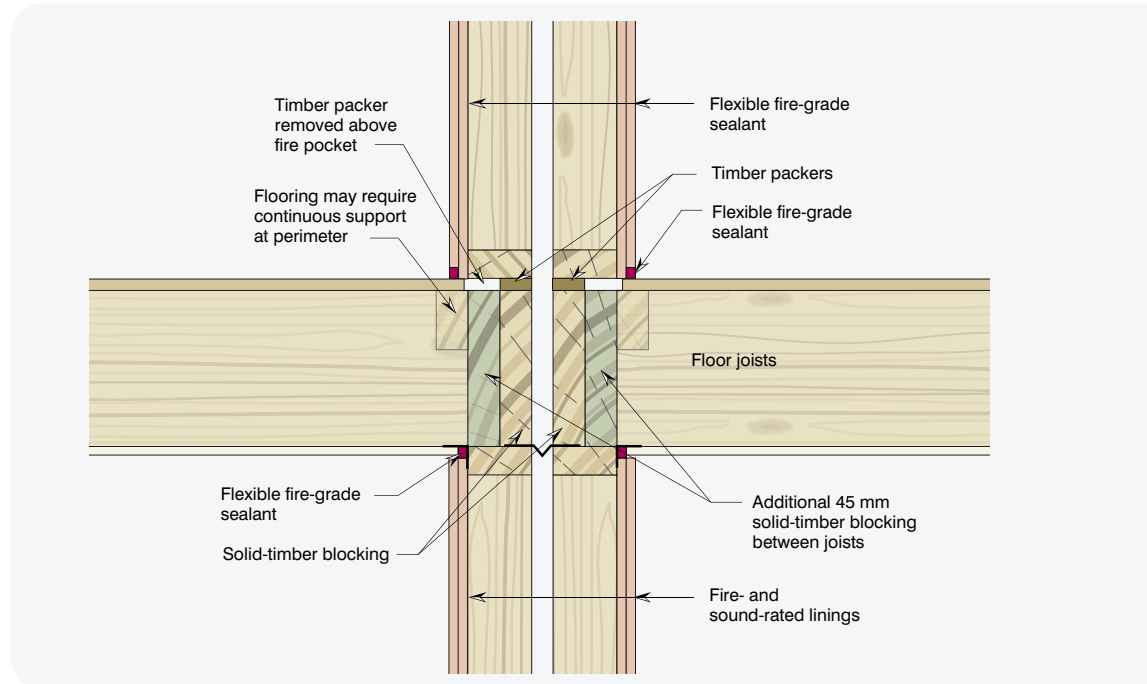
Pockets created in separating wall to accommodate floor joists – FRL 60 minutes only – elevation view.
